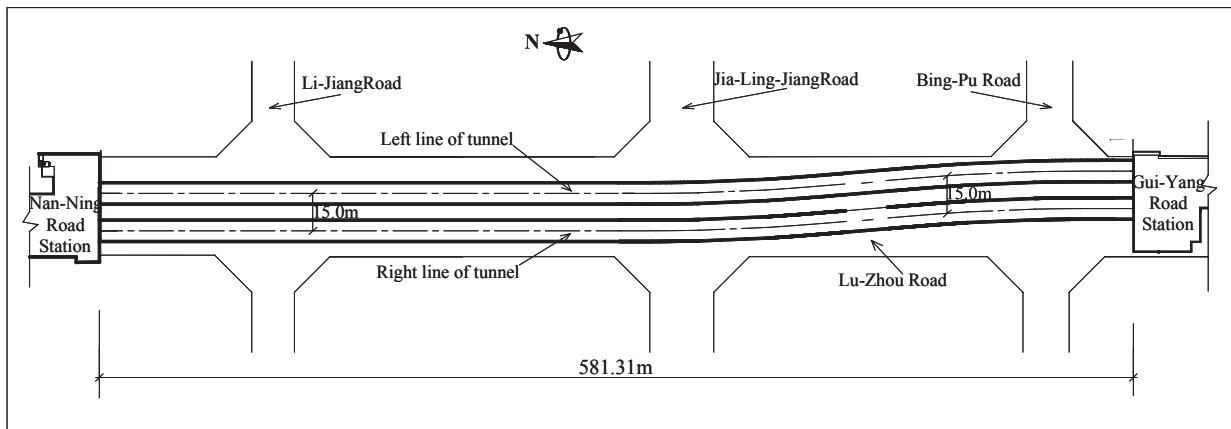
Typical layout of metro line 1 in Hefei city: from Nanning road station to Guiyang road station.
